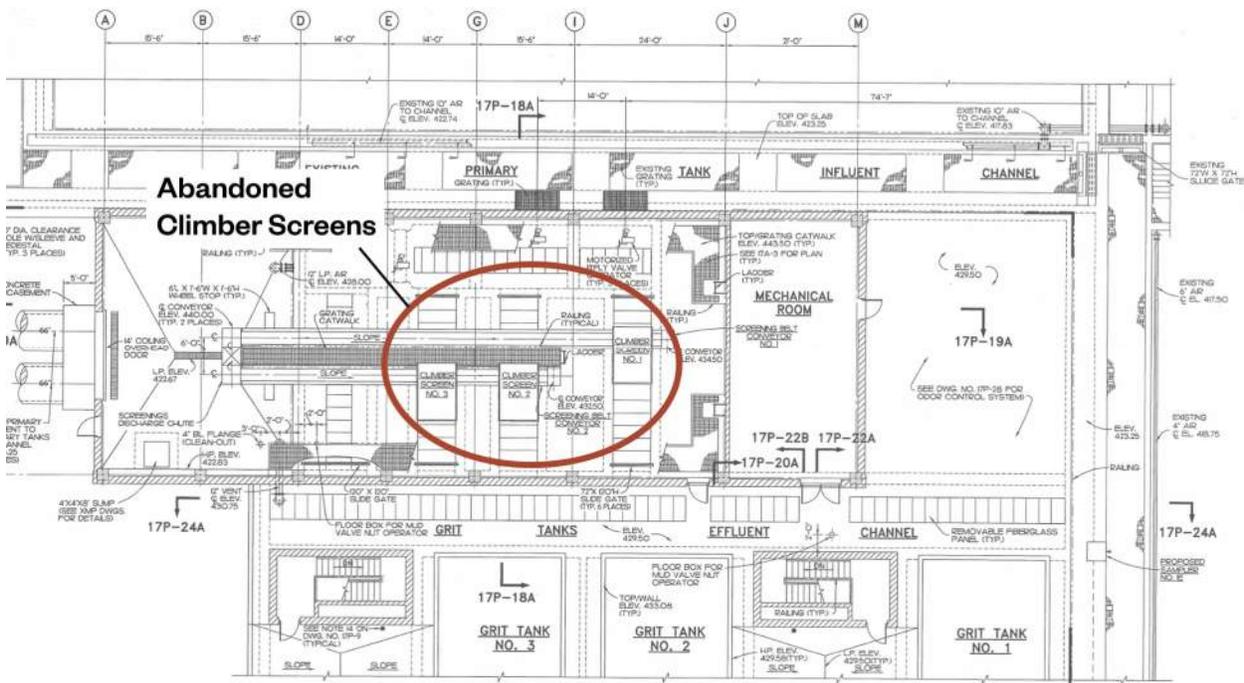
Plan Drawing of Abandoned Climber Screens at South Grit Facility
